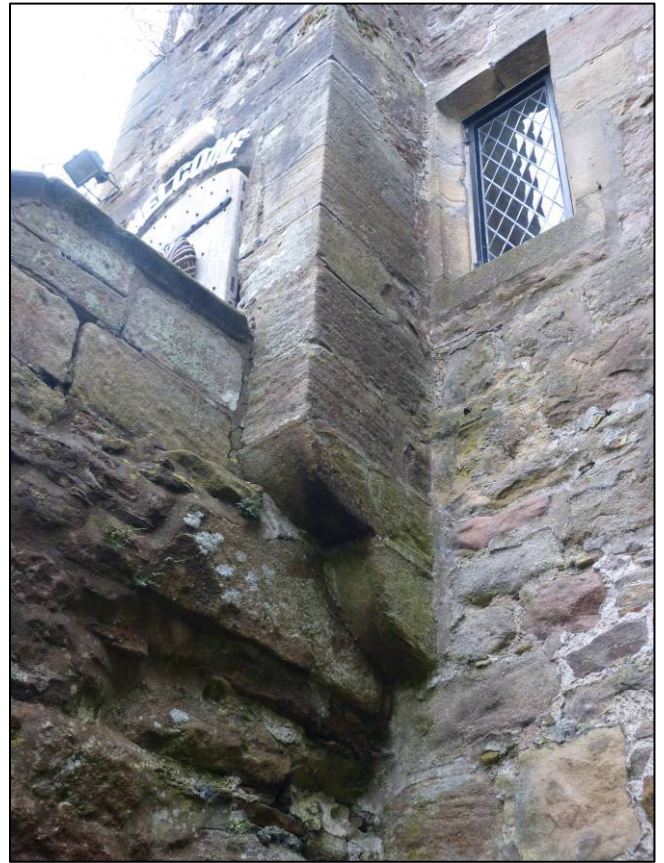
Tower, corbelled projection on east elevation, looking S (photo 1/166).
